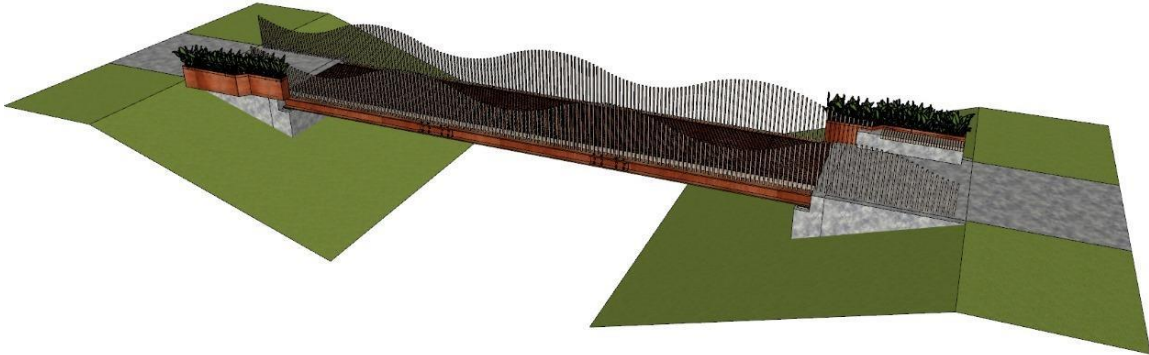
Architectural design of Piedicavallo pedestrian bridge
